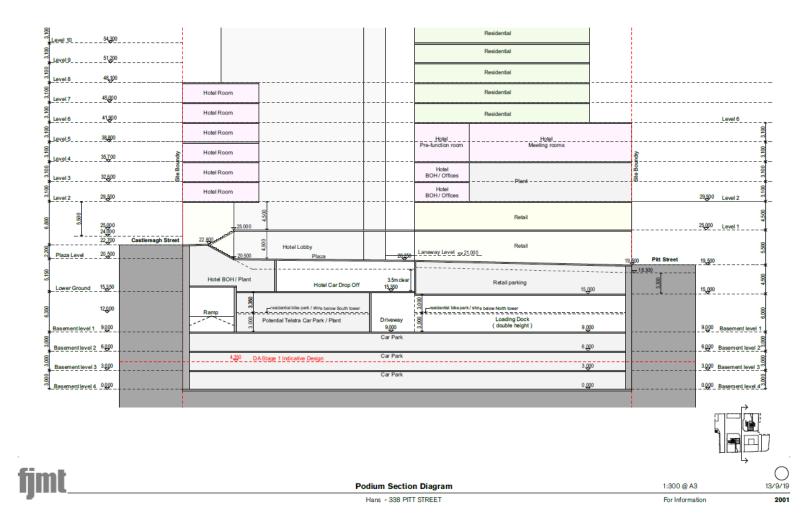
Indicative section plan showing layout of buildings and basement levels. Francis-Jones Morehen Thorp Pty Ltd, September 2019.
